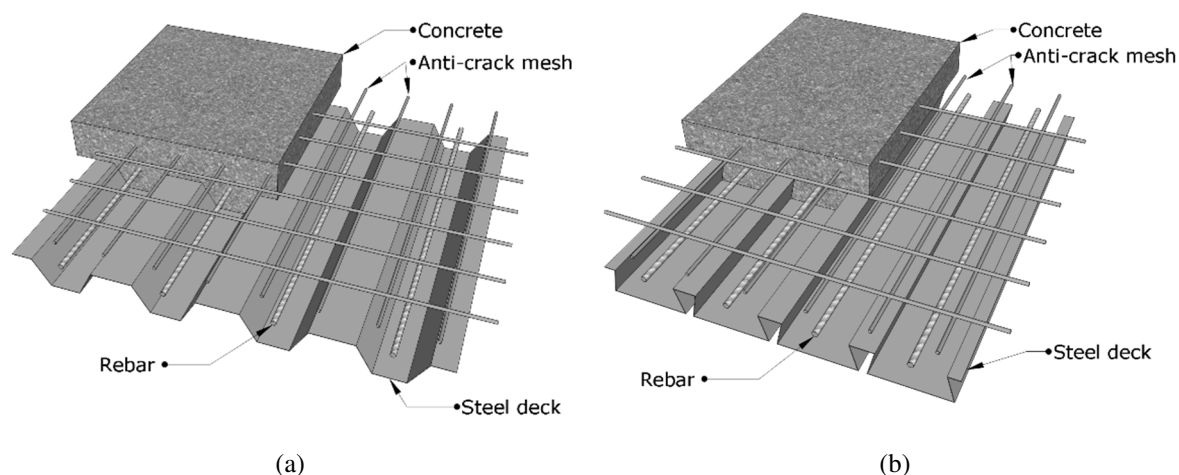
Usual layout of composite slab profiles: (a) Trapezoidal, (b) Re-entrant.
